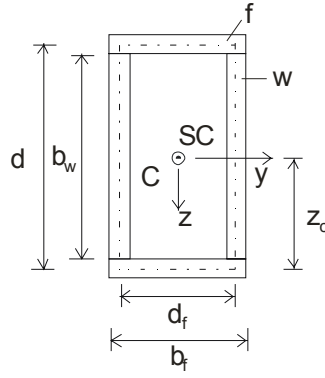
Cross section of a thin-walled rectangular closed section beam
